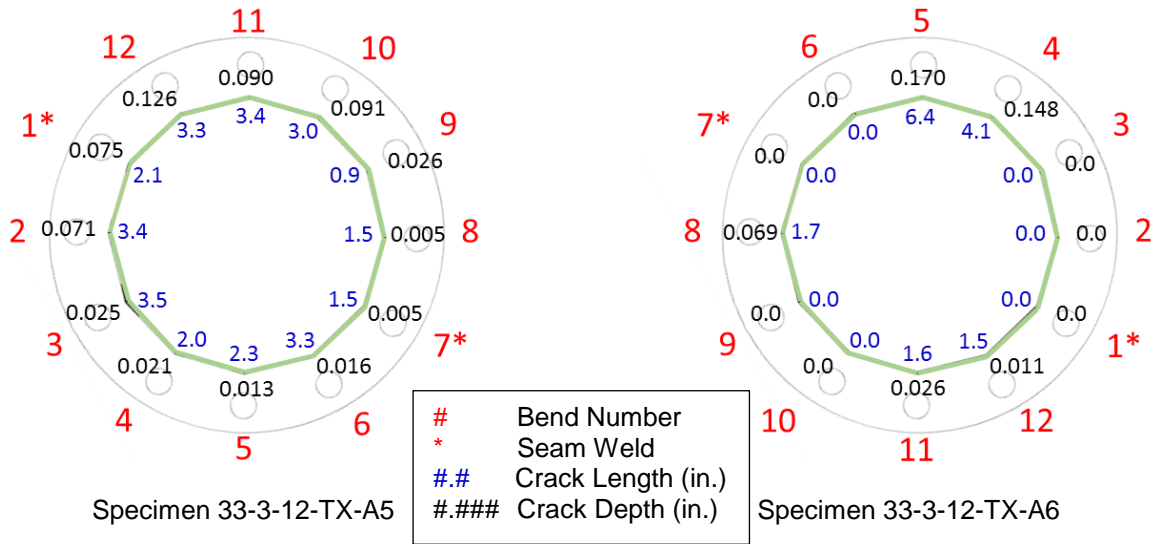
Specimens 33-3-12-TX-A5 and 33-3-12-TX-A6: Cracks after 129.7 Million Fatigue Cycles
